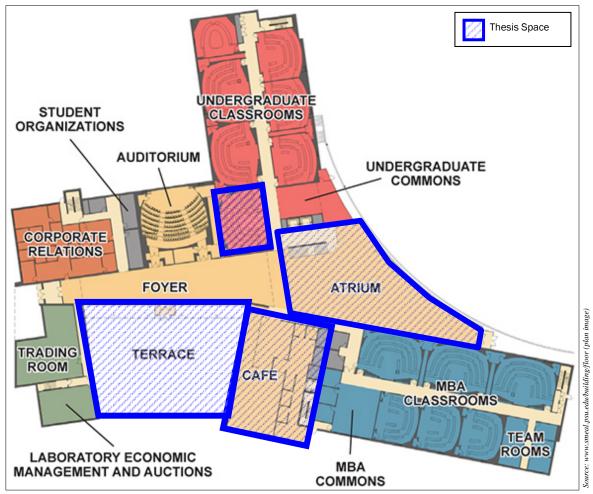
Basic plan view of first floor with thesis spaces highlighted in blue.
